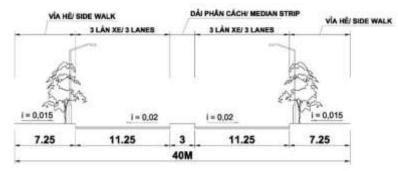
Planned Cross-section of TD7 Road, Section Crossing Line 2.3
